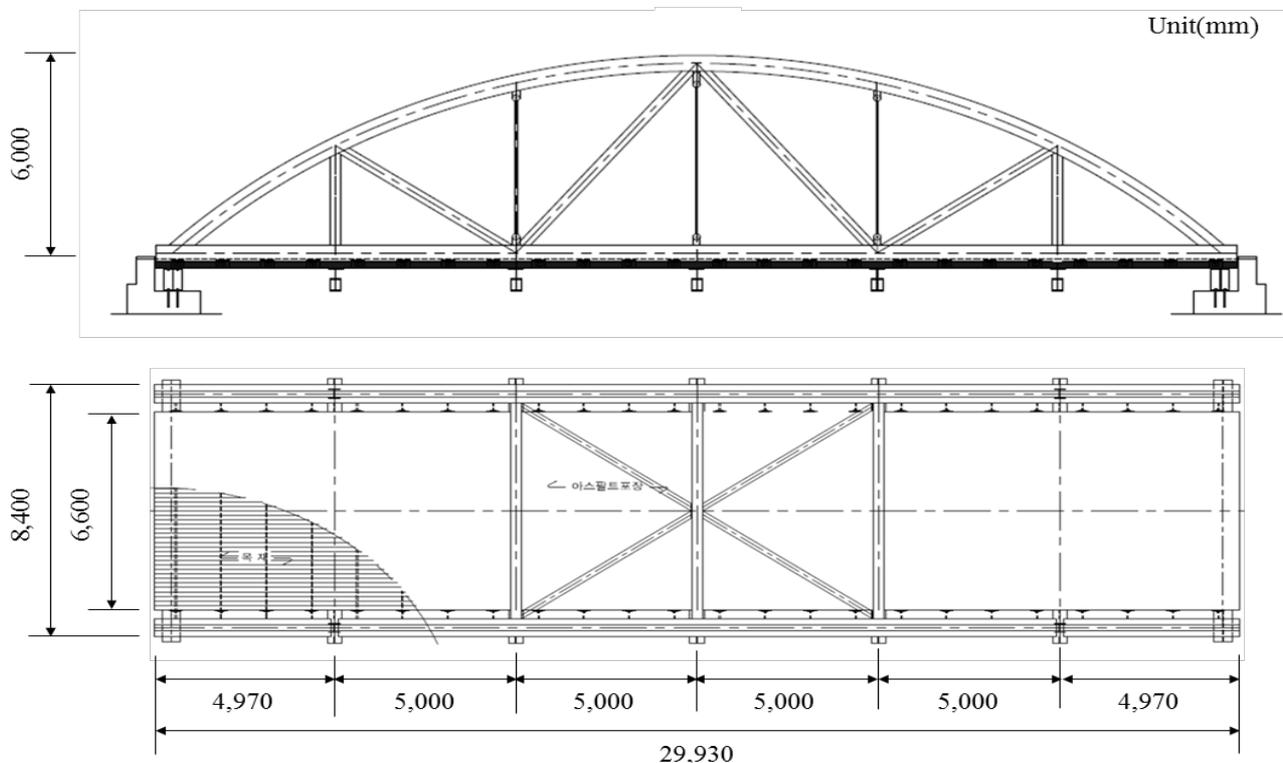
Longitudinal section and floor plan of bridge designed in 2011 (Named Hanareum bridge later)
